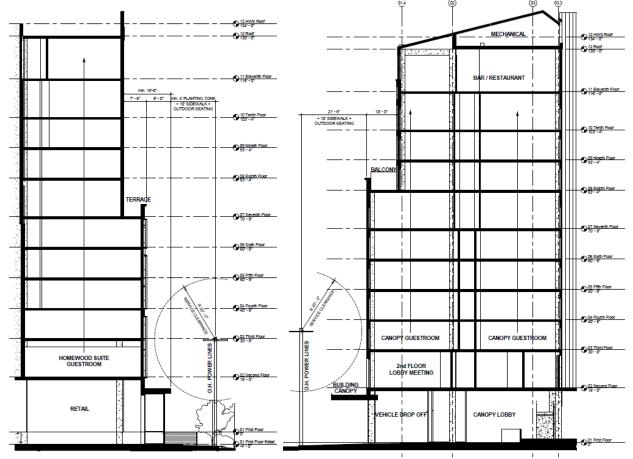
Division Street (Left) and Overton Street (Right) Sections
